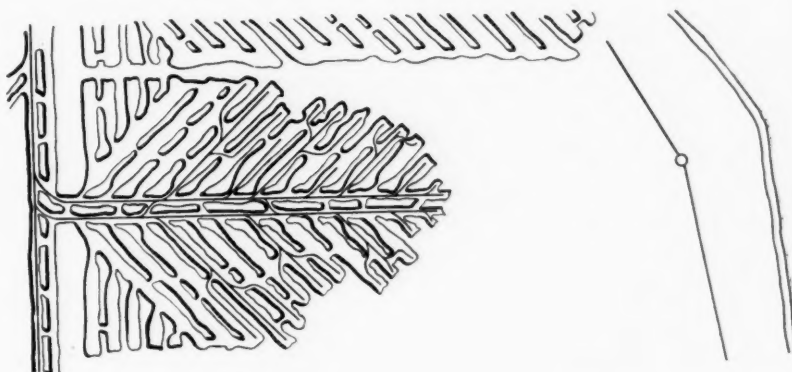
Typical panel at Little Betty mine showing key room and pick-up system.
